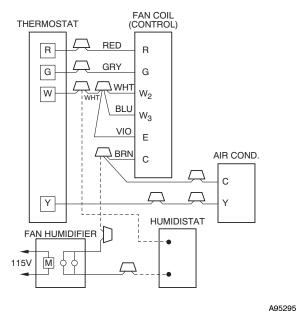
Wiring Layout of Humidifier to Fan Coil With Electric Heat
